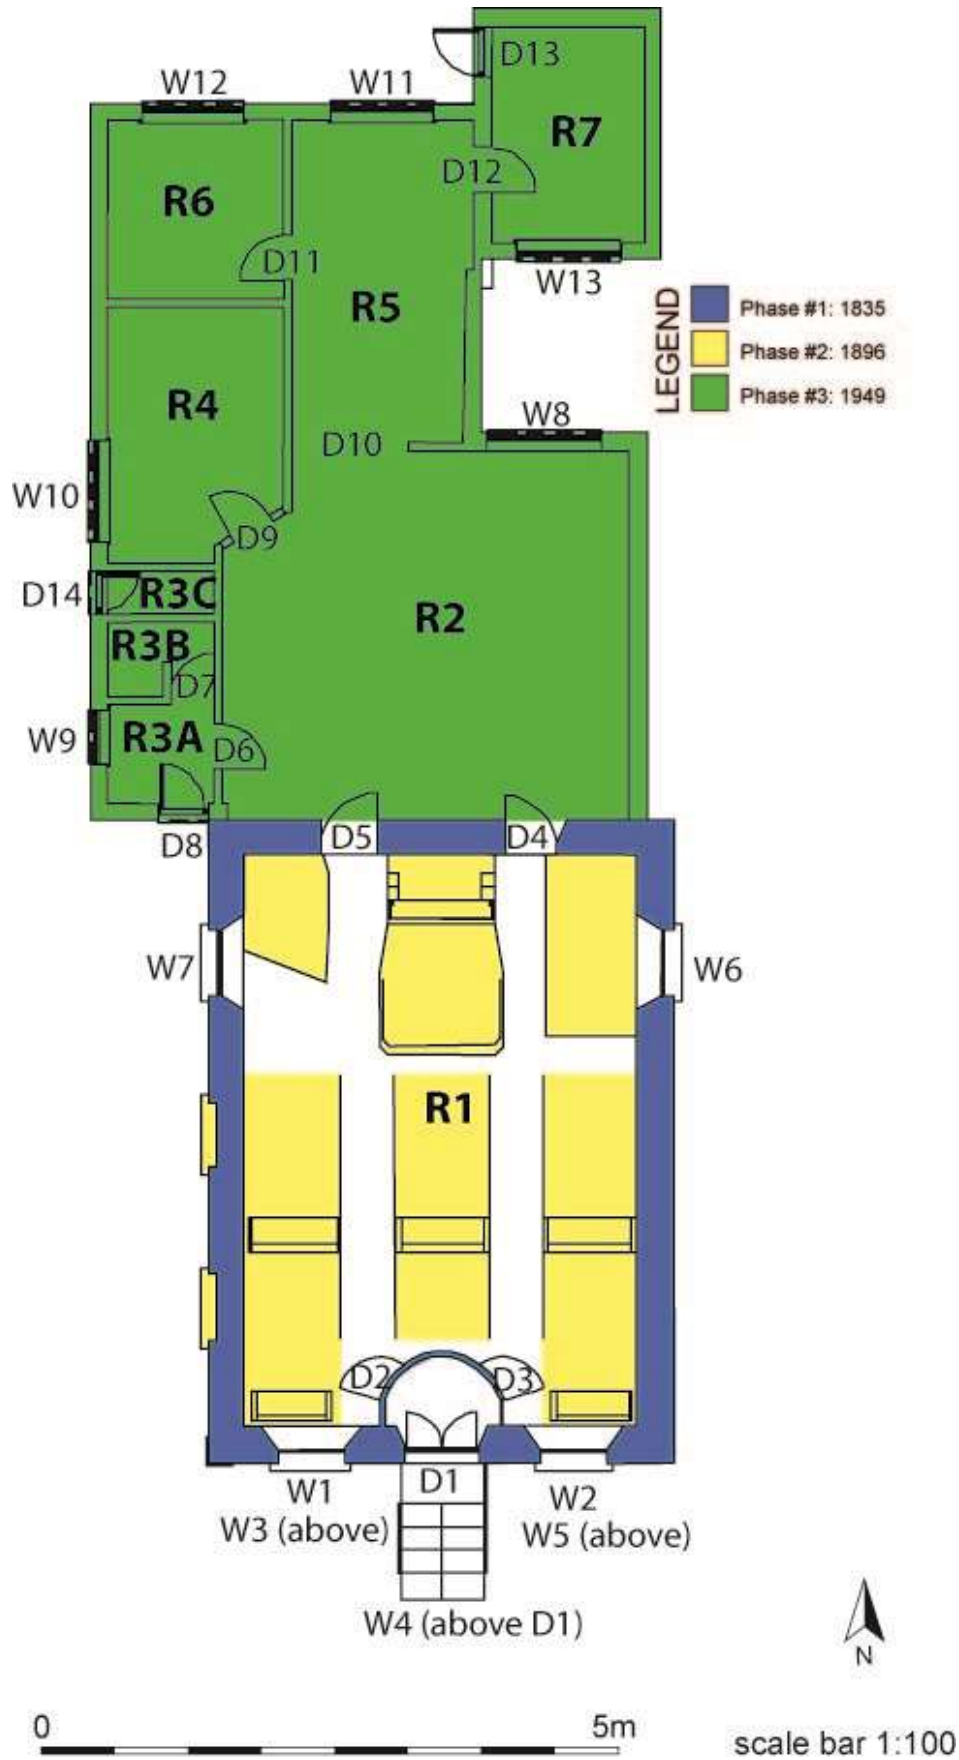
GROUND-FLOOR PHASED PLAN (BASED ON SUPPLIED DRAWINGS).
